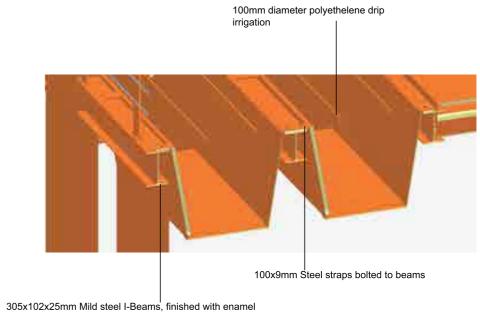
Typical detail section cutting through the planters fitted on the folly
